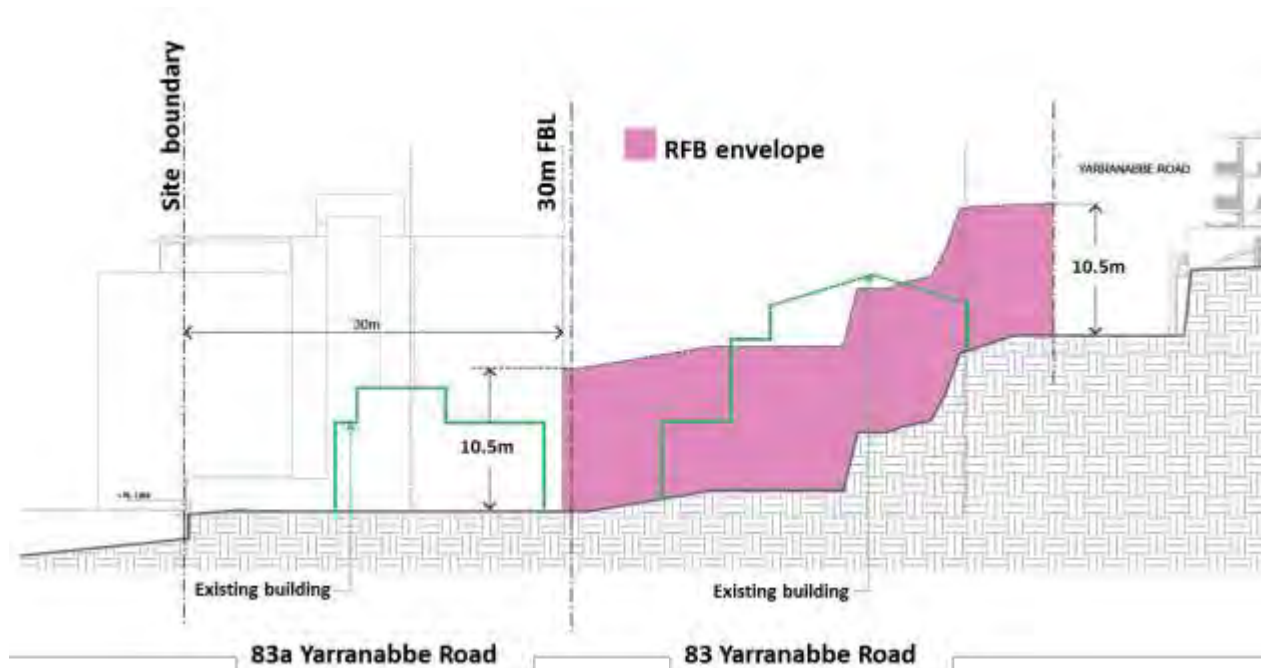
Existing Woollahra LEP 2014 building envelope for multi dwelling housing or RFB development
